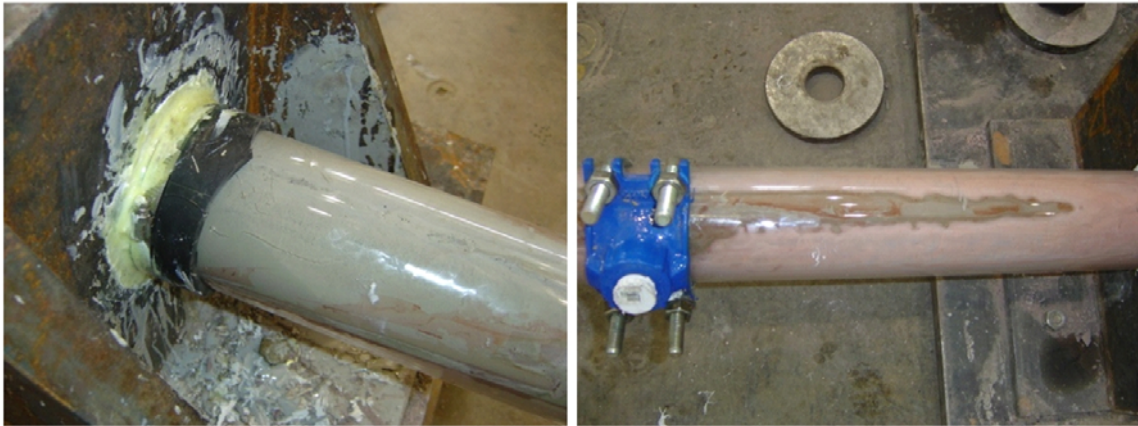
Repair Grouted Ducts of Specimen PVG-C2-1.
